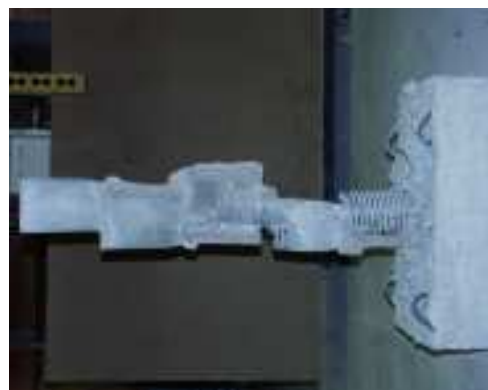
Wall C-1 Grouted reinforced confined column after testing
